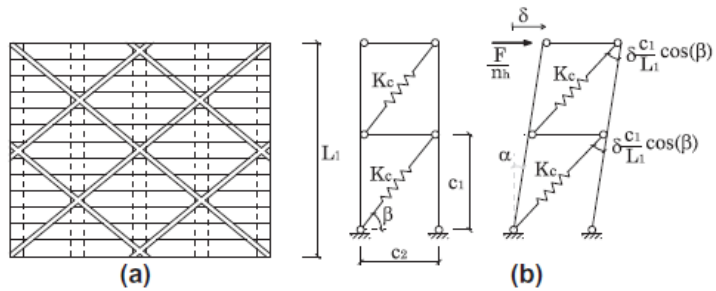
Timber floor strengthened with diagonal CFRP strips (a) strips arrangement on the floor top surface and (b) simplified mechanical model for a single cell.
